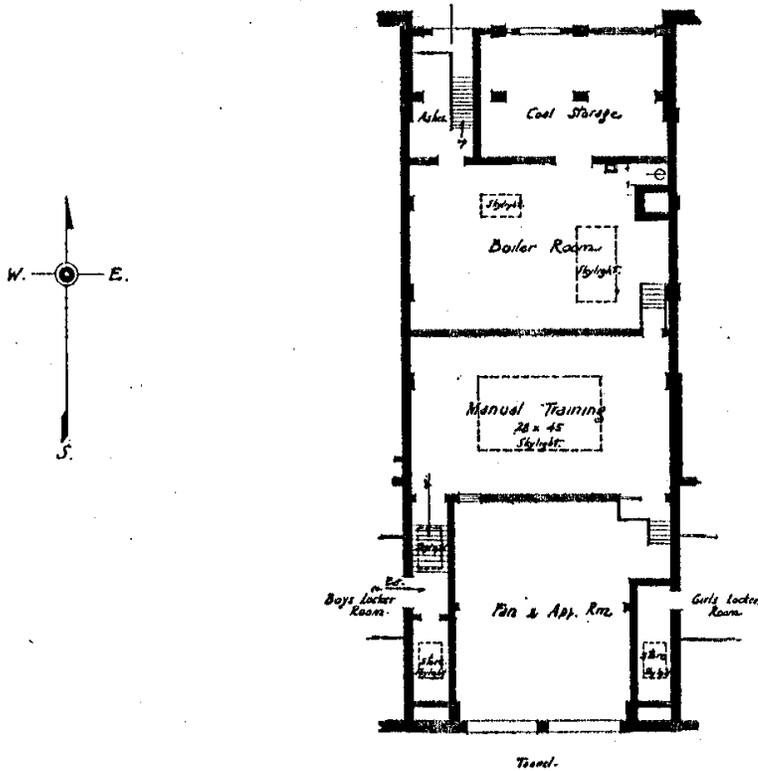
HIGH SCHOOL, GROUND FLOOR PLAN, GREENFIELD, OHIO.
